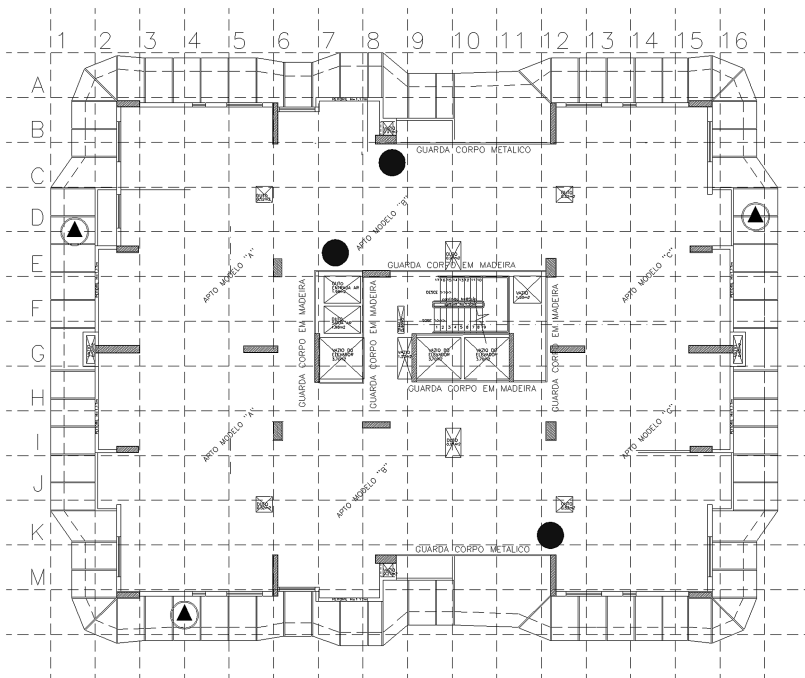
Floor plan of the 13th floor of the construction site where the tests were carried through.
